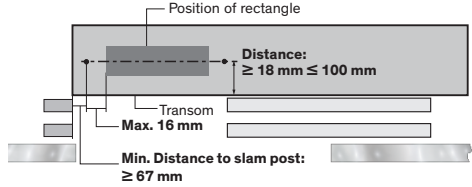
Position of the rectangle in the transom (right side-opening doors)
